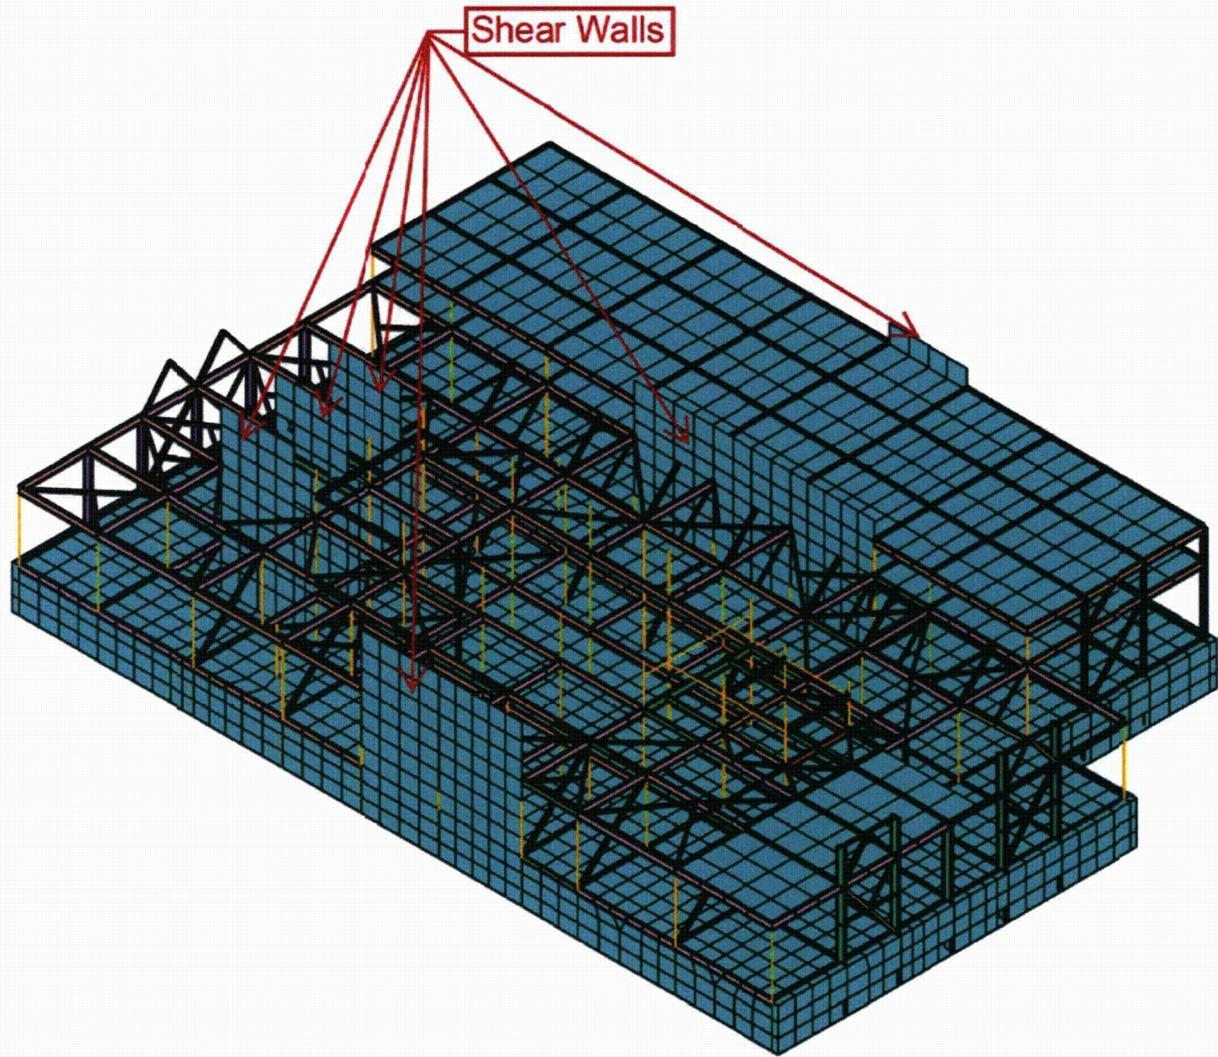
(Isometric View of the Turbine Island Structure (GT Strudl Finite Element Model))
